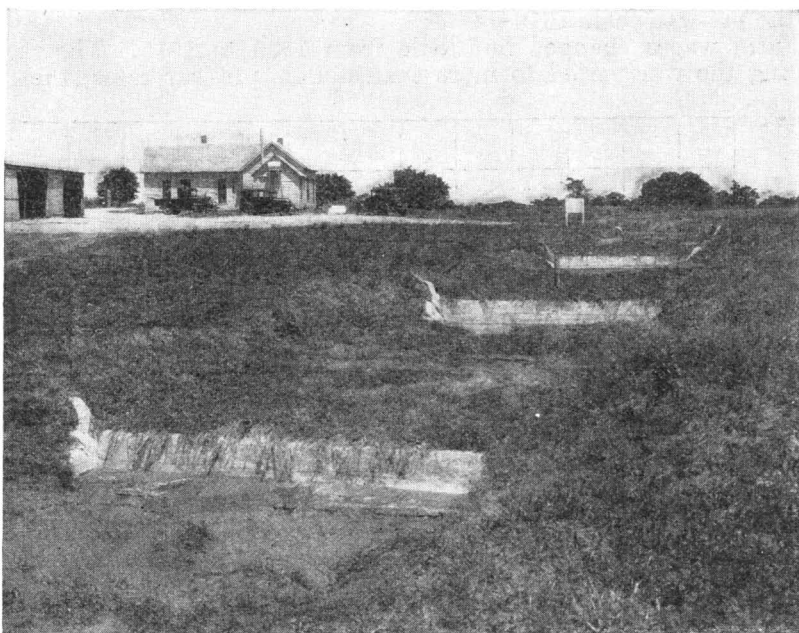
Concrete check dams in terrace outlet ditch with Bermuda grass growing on sides and bottom.
